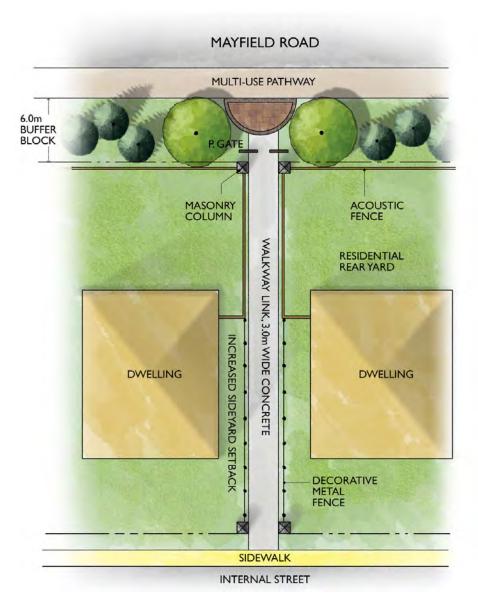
6.0m Wide Buffer Blocks on Mayfield Road and 3.0m Wide Walkway Links to Mayfield Road
